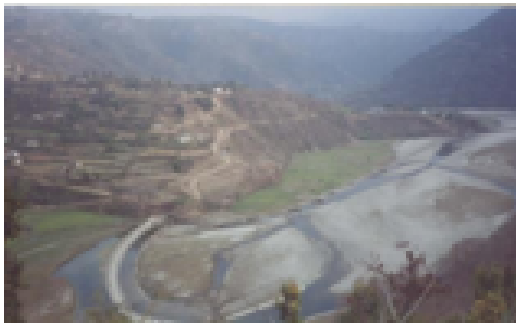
Existing 12MW Jhimruk Daily Pondage Hydropower Project Downstream
